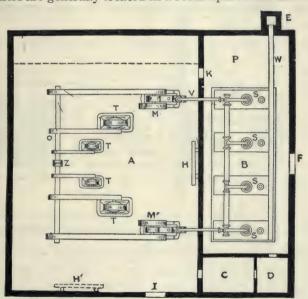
,720.—Floor plan of an electrical station having a belted drive with counter shaft.
